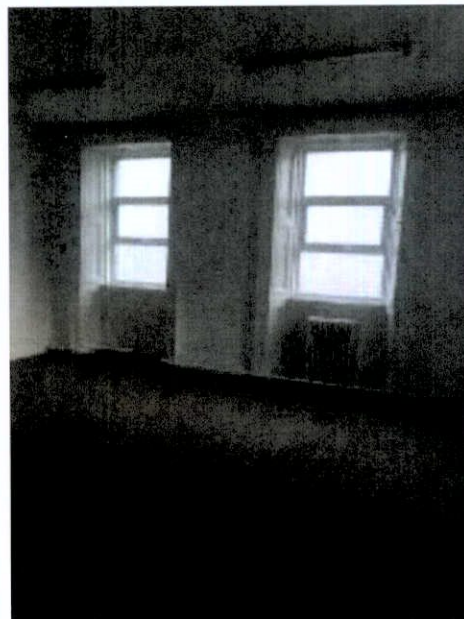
Large dormitory with original panelled window reveals, replacement window frame.
